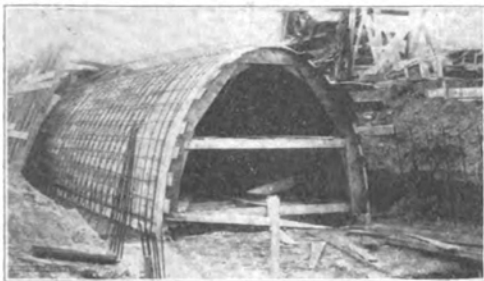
Standard 12-ft. Reinforced Concrete Arch Culvert Under Construction, C. M. & St. P. Ry.
